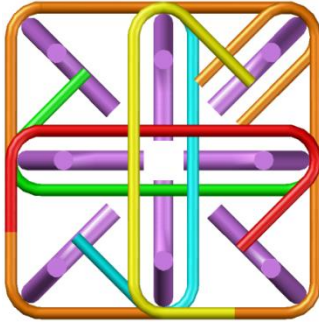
Reinforcement Cage Configuration at the Top of the Column
